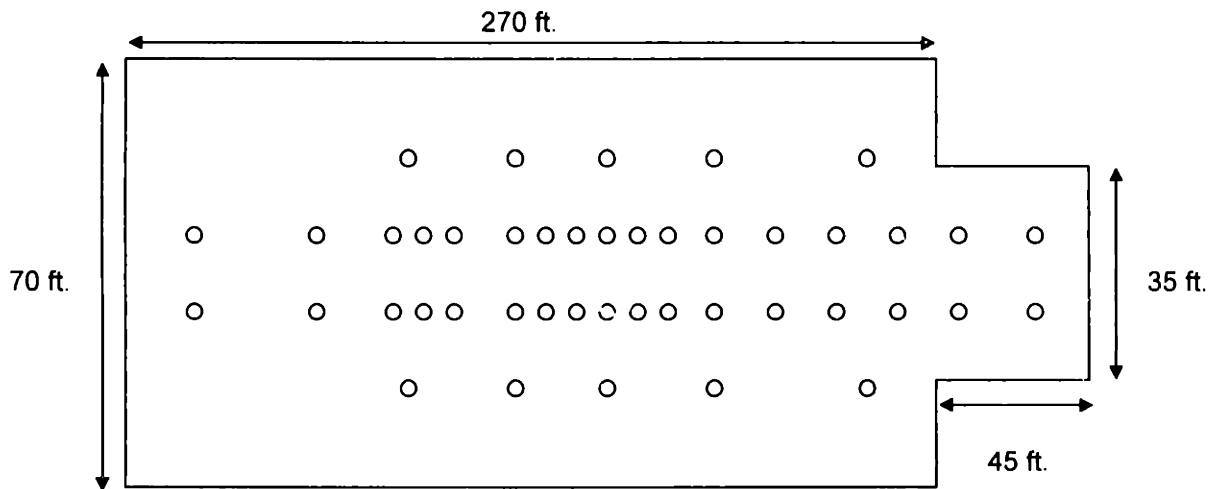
Tie-down locations in foundation raft for conceptual design – plan view.
